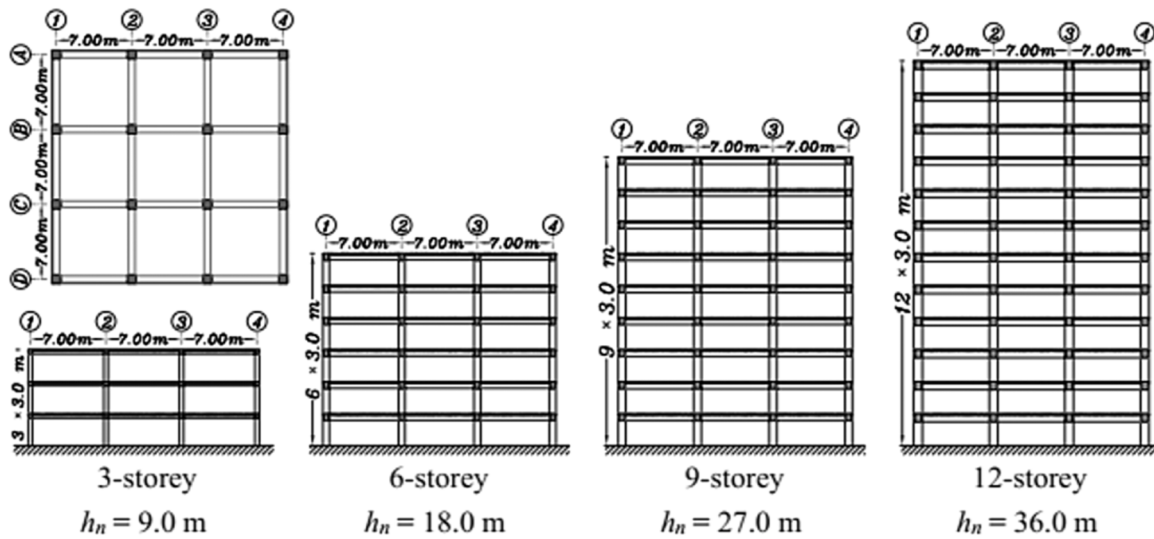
Plan and elevation views of the archetype reinforced concrete moment-resisting frame buildings used in this research [63].
